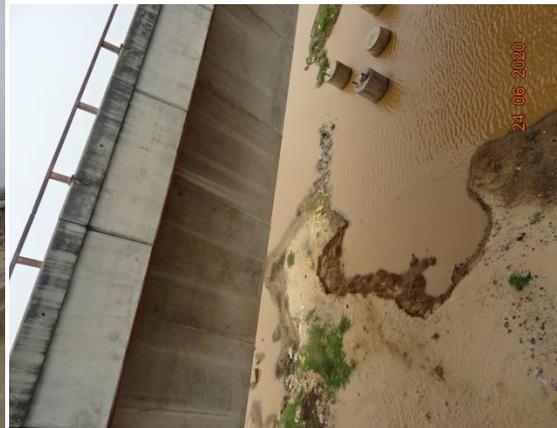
Photo of sand cutting near the pillars of the bridge over river Son
